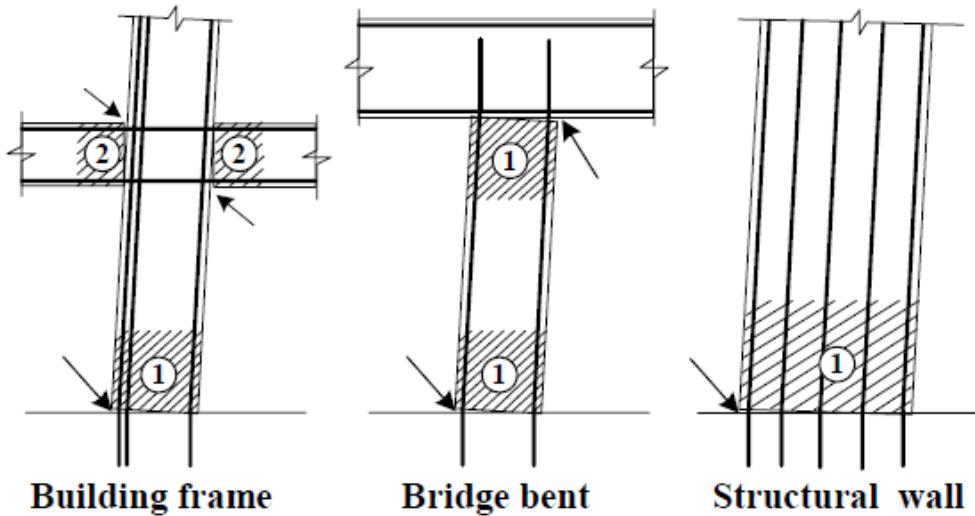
Inelastic Regions in Properly Designed Reinforced Concrete Structures (Zhao and Sritharan (2007))
